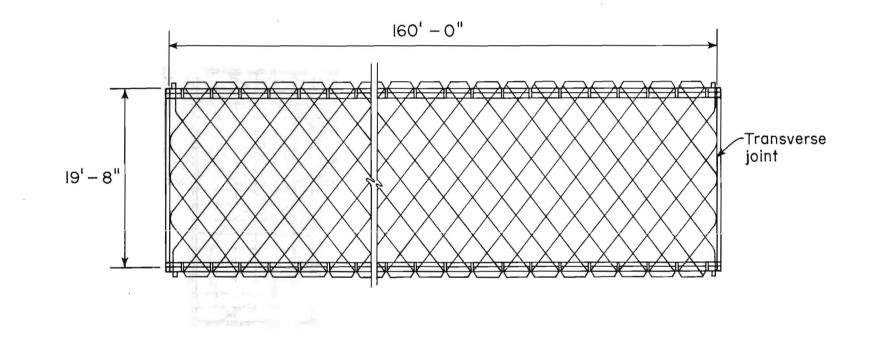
ARRANGEMENT OF TENDONS IN PRESTRESSED PAVEMENT AT ESBLY, FRANCE
